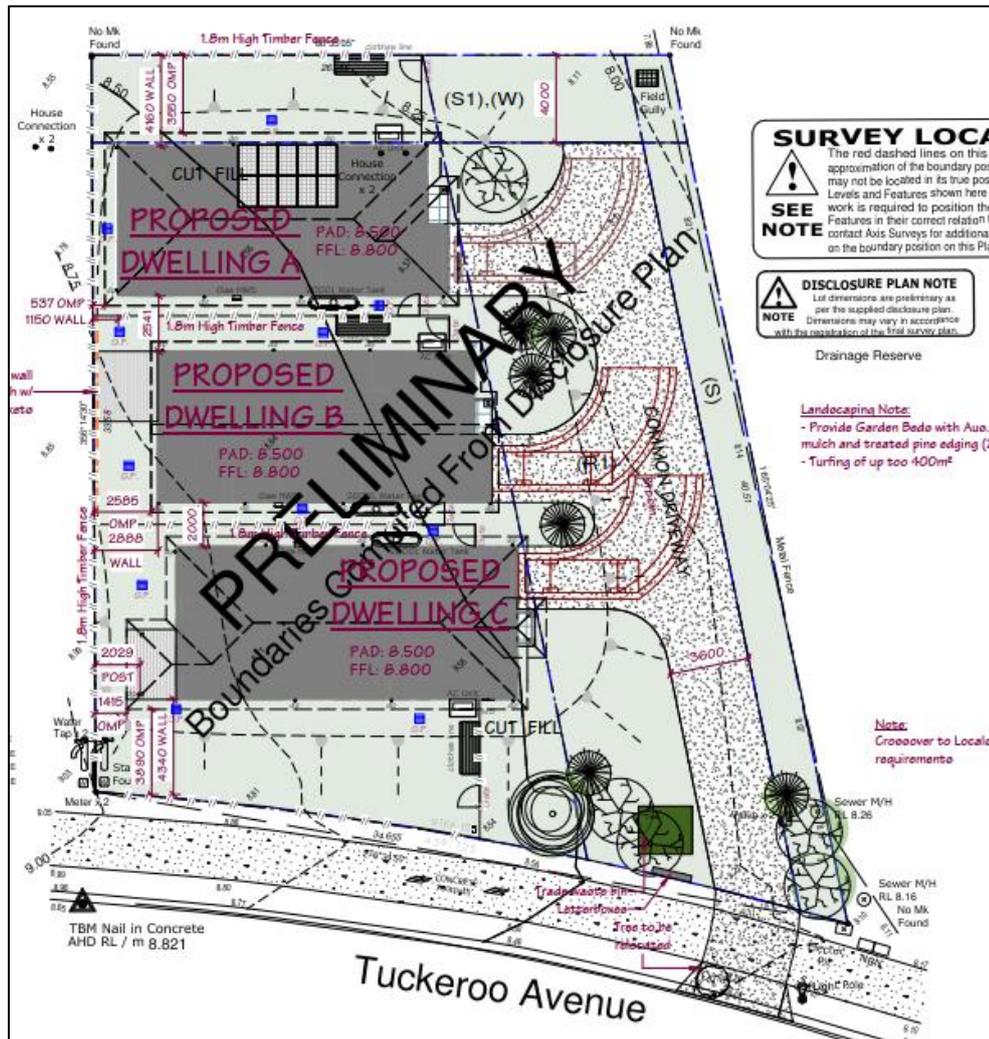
Proposed Development Layout (Source: Stroud Homes Site Plan 2102773)
